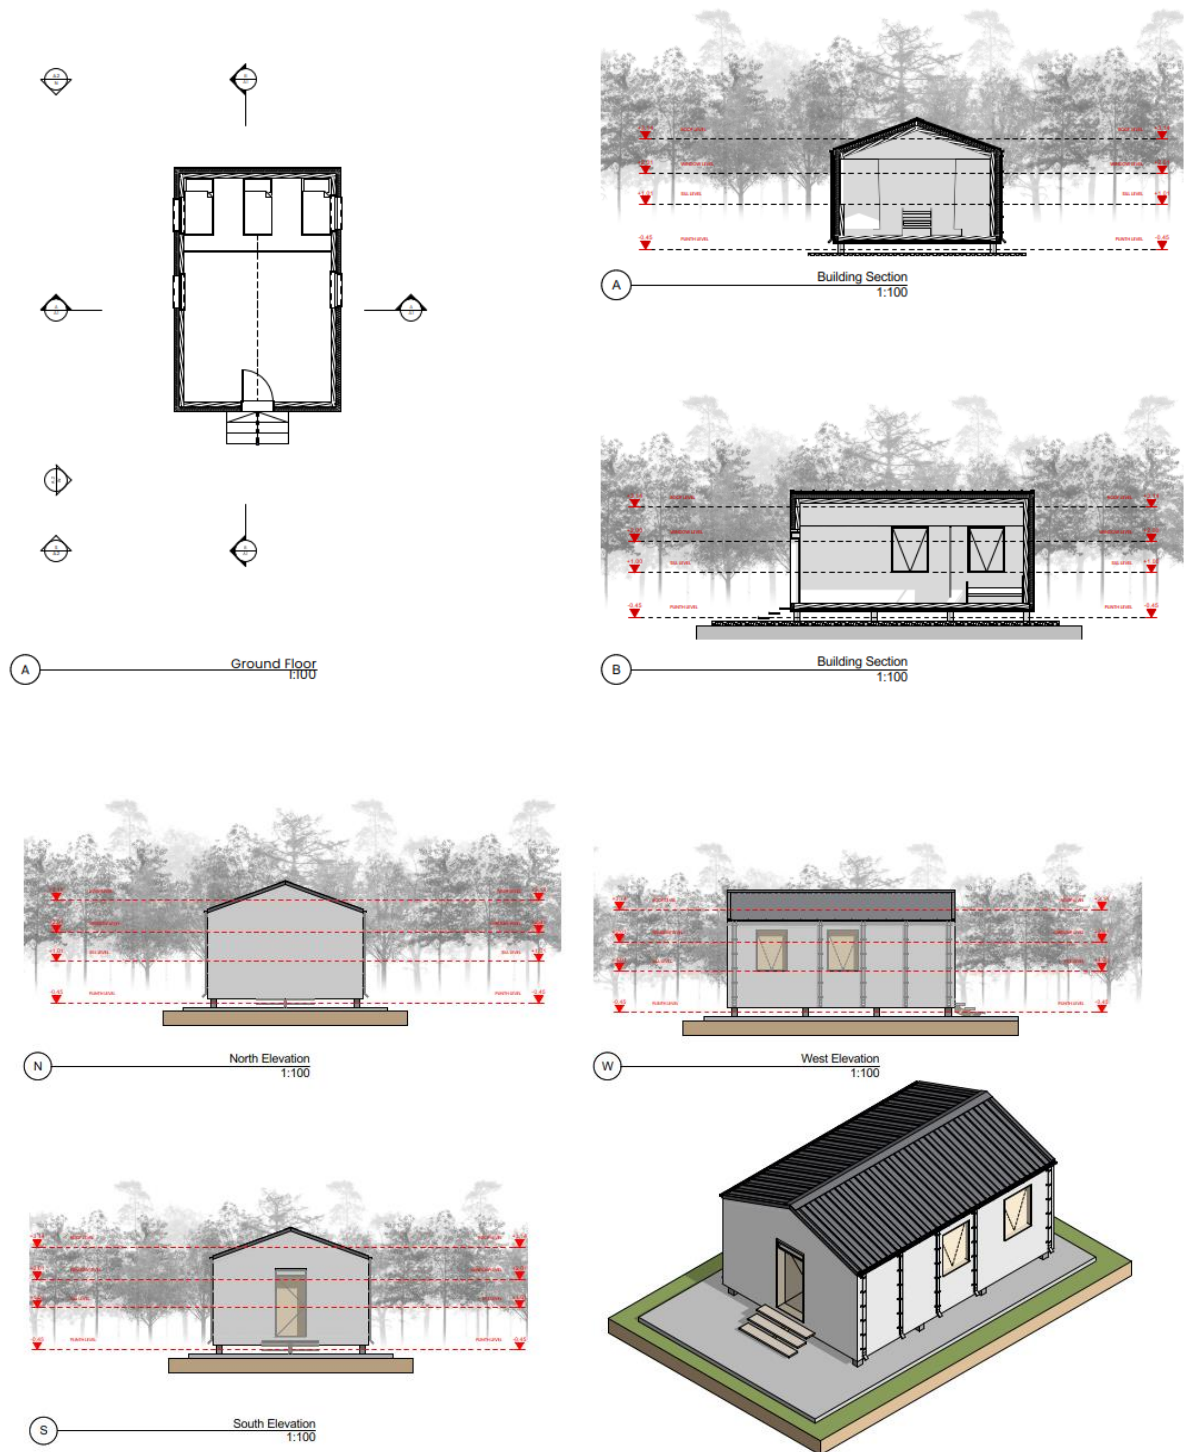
First phase drawings (It includes plan, elevations, sections, and 3d model)
